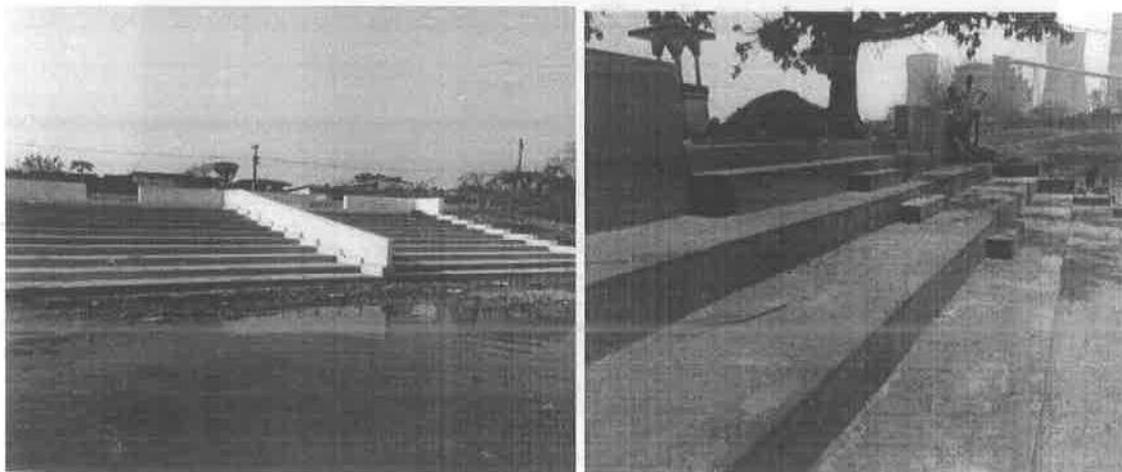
Construction of Stairs near Dadu pond, Patadi Nala, Darri Pond and Nimohi pond at Badadarha, Rampur & Baispali
